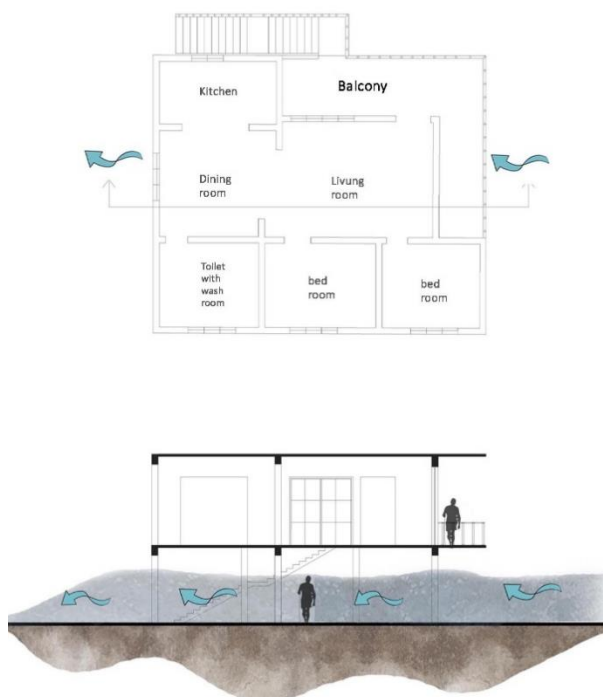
(a): Floor Plan and Cross Section showing movement of flood water and level of inundation in Case 8 (Source: Henarangoda, 2020)
